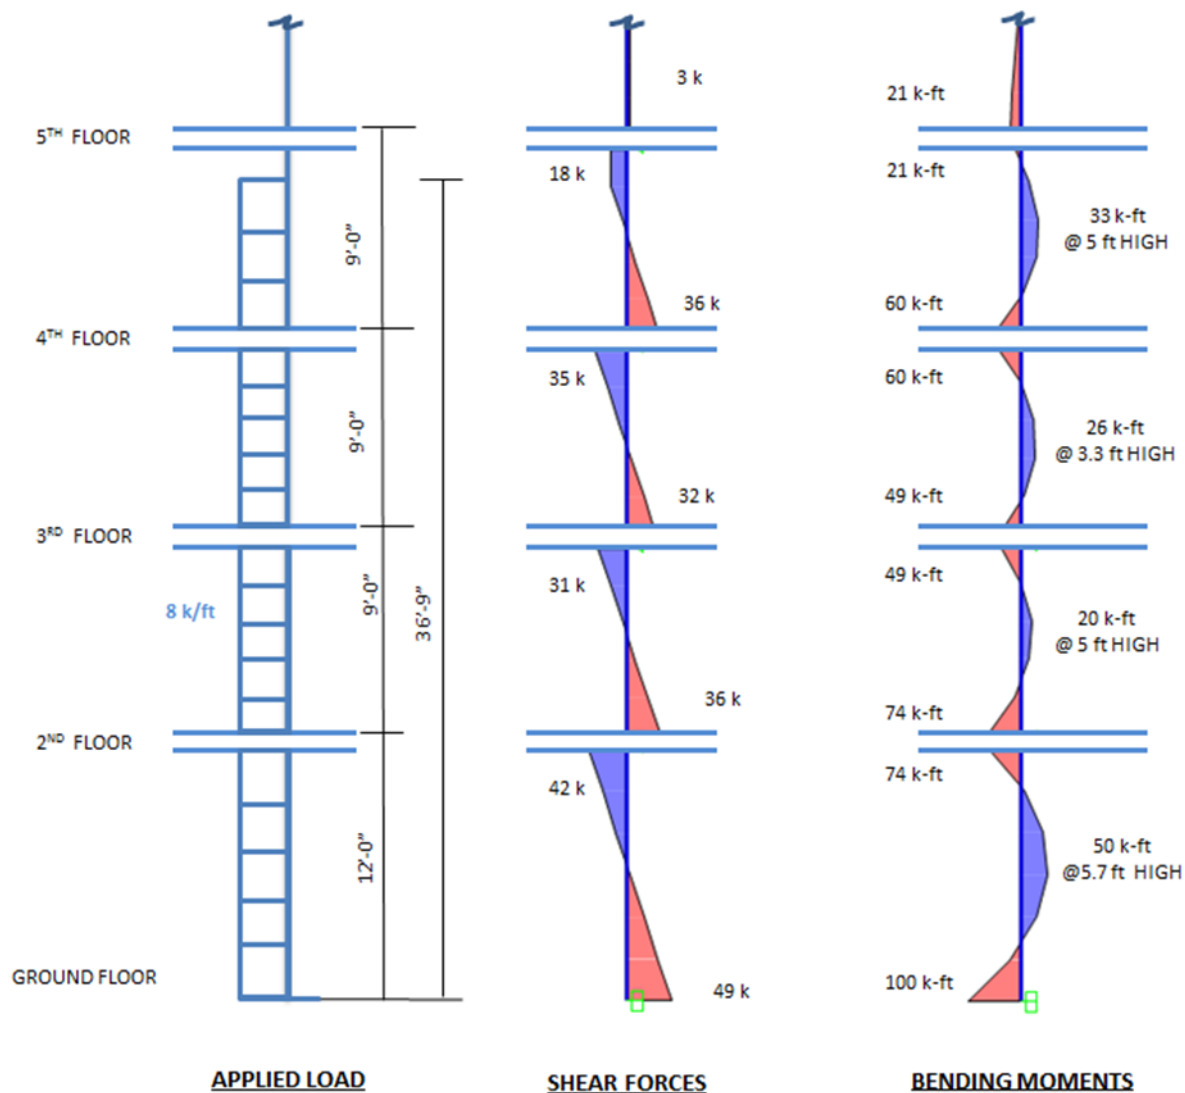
Hydrodynamic loading on interior column of Hilo residential building due to Load Case 2
